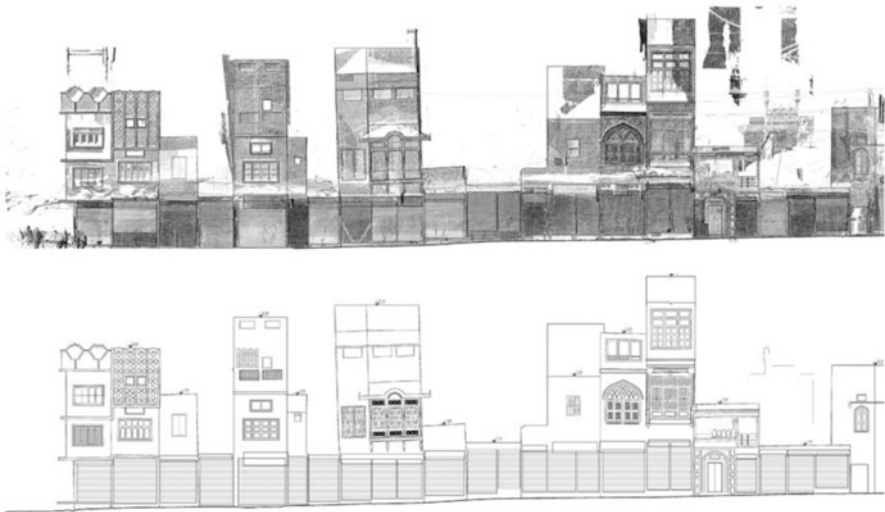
Layout of elevations along Haram Bazaar (urban design team)
